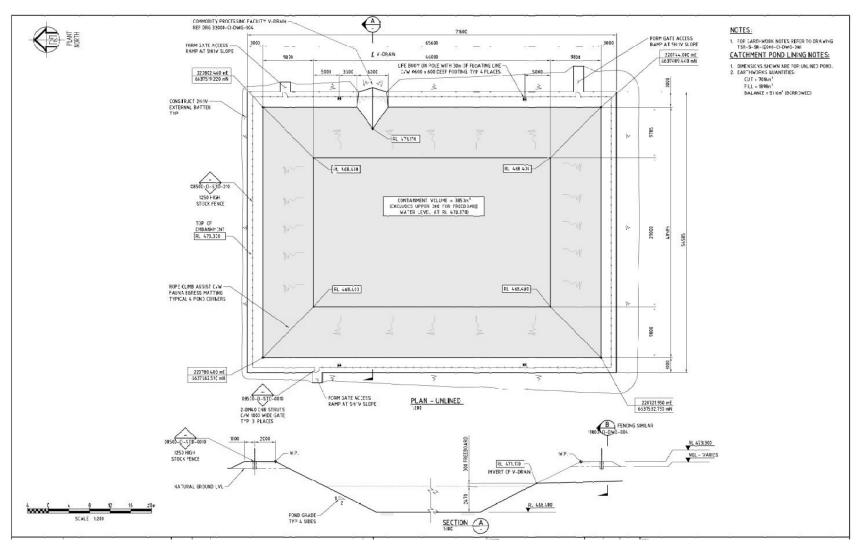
Temporary Waste Storage Area – stormwater pond construction detail Figure provided by the Applicant
